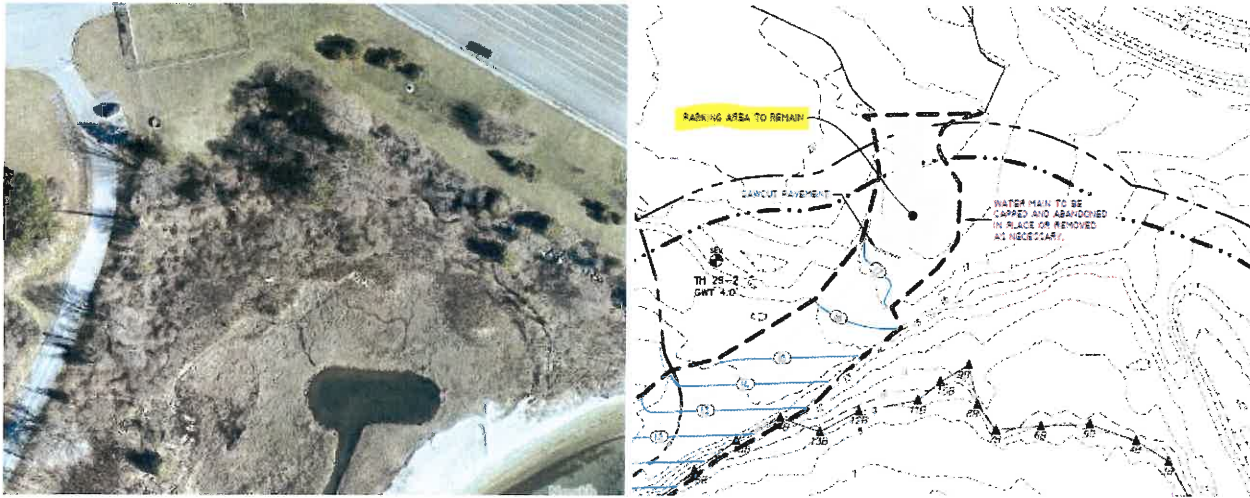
Aerial image of small parking area, plan set depicting this parking to remain.
